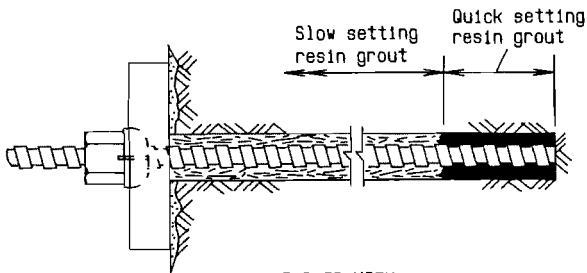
Grouted End Anchorage, Polyester Resin (U.S. Army, 1980).
